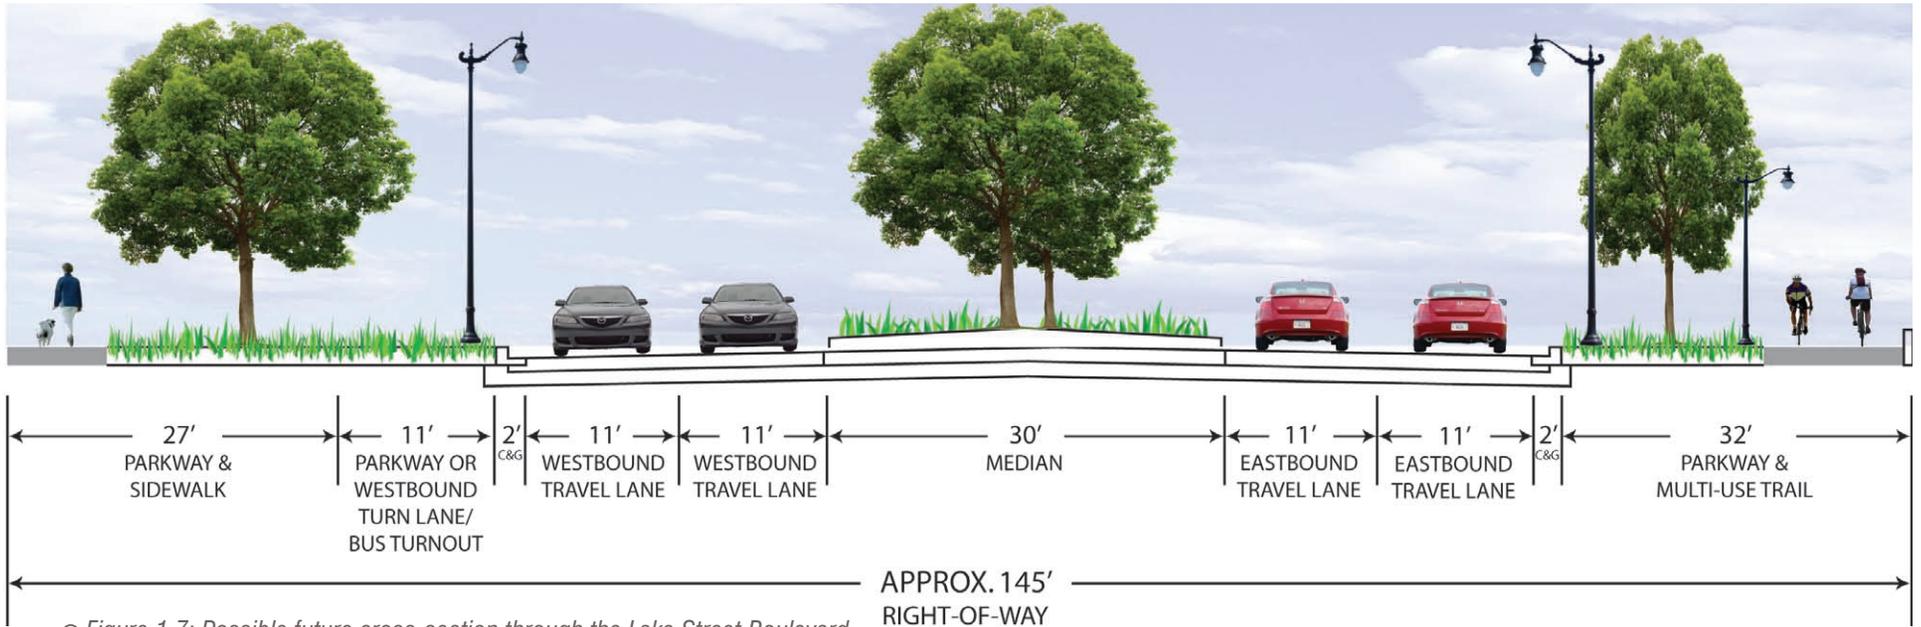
Possible future cross-section through the Lake Street Boulevard
